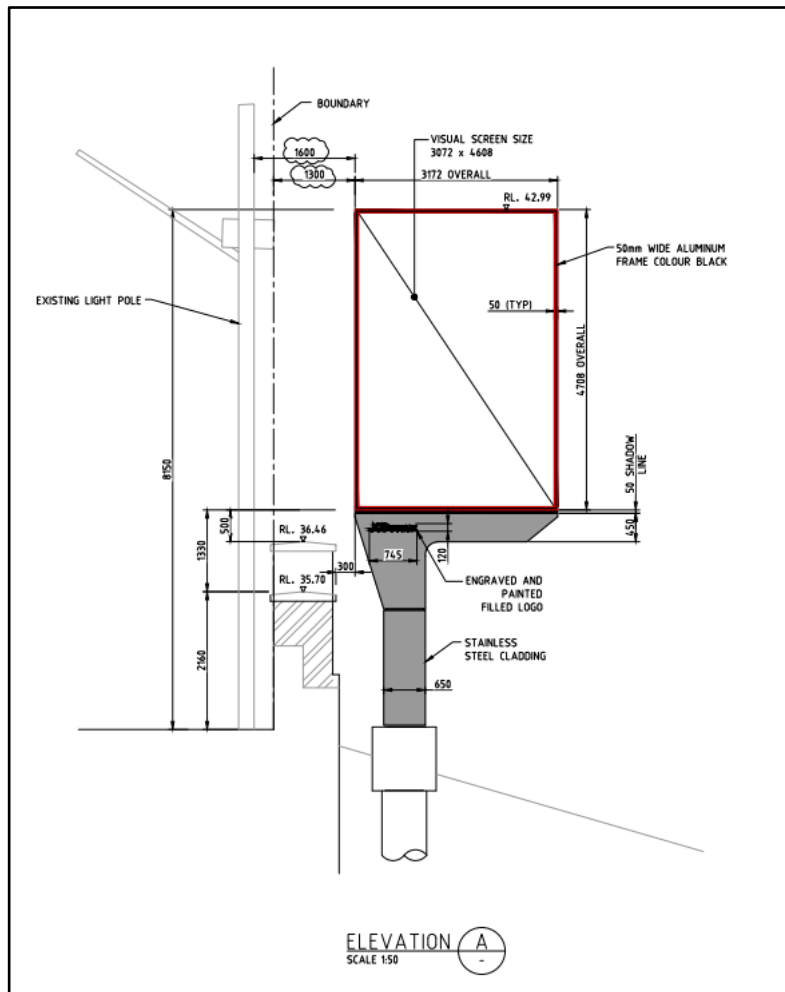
| Elevation A of proposed signage (Source: Dennis Bunt Consulting Engineers)
